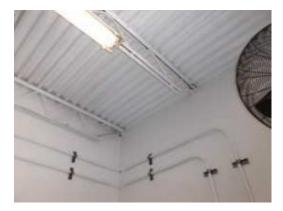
Roof joist to wall connectionrecommend adding bracket to secure wall and roof
